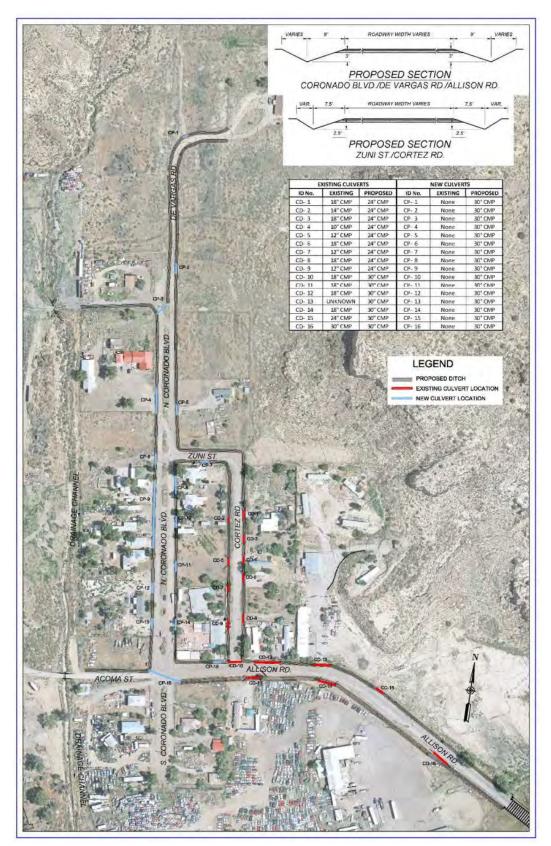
Culverts and Roadway drainage Locations (From WSP 2020).
